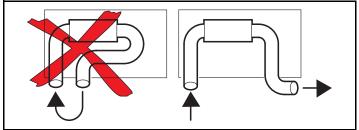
Avoid air crossover between cold air inlet and hot air outlet)
